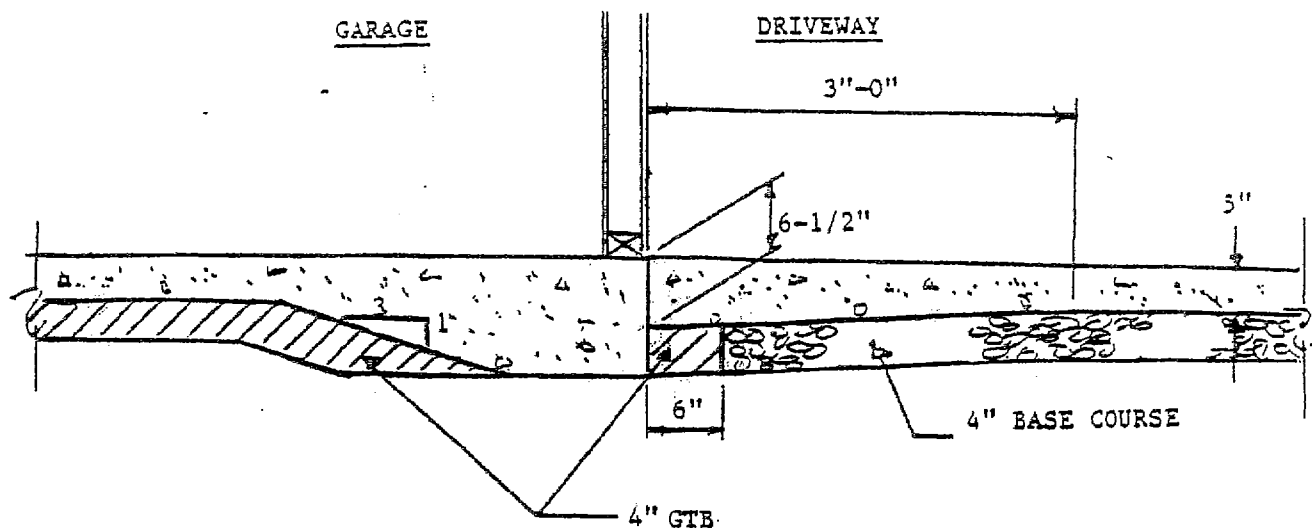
TYP. GTB DETAILS AT GARAGE TO DRIVEWAY INTERFACE
